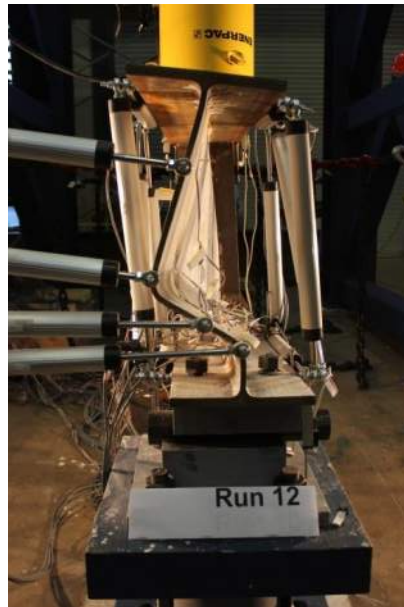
Undamaged Girder Longitudinal: +0.50 in without Load
